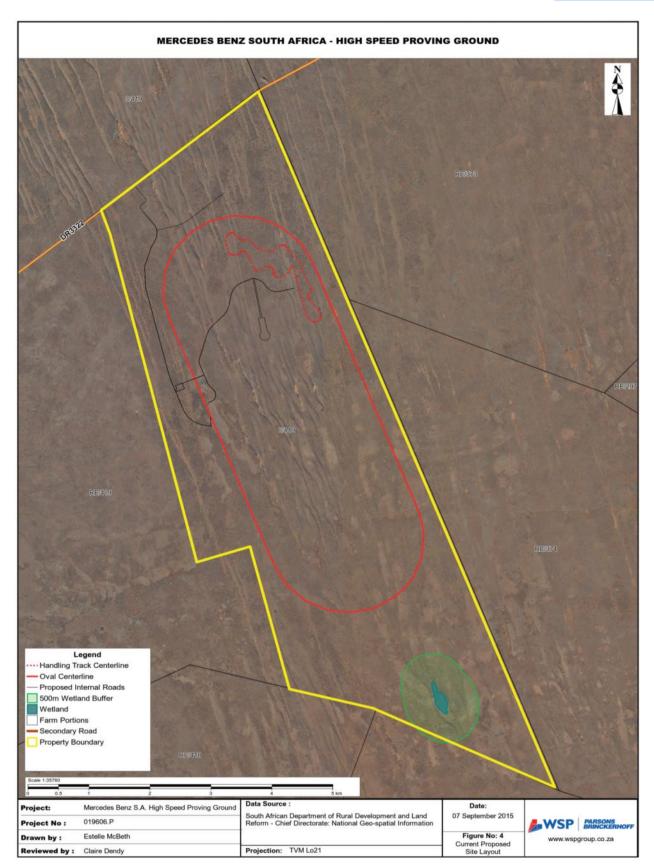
Final Site Plan for the Development of the MBSA High Speed Proving Ground
